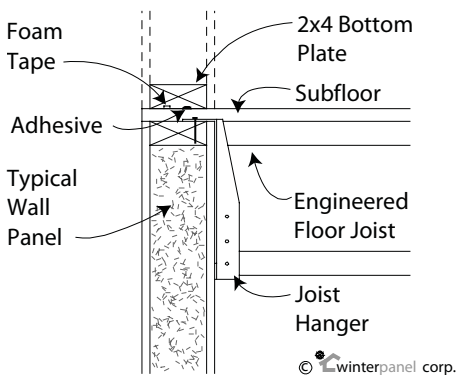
Securing Edge Joist to Side-wall. Adhere and nail the edge joists to the wall panels at both the top and bottom to prevent deflection of the floor at the wall edge.
